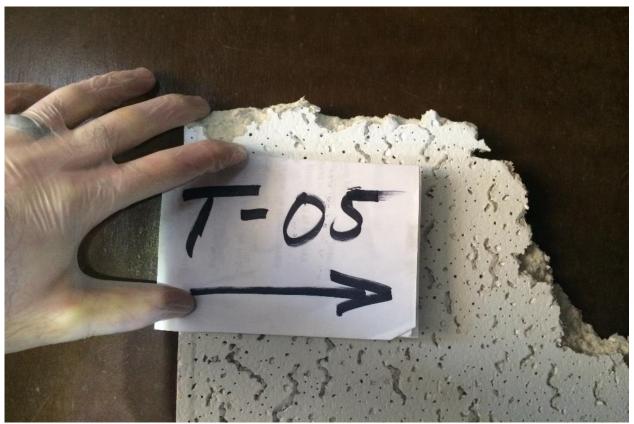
Laboratory analyses detected 2% chrysotile asbestos within suspended ceiling tile sample TS-06 collected from the Theatre Building hallway (sample should be labeled TS-06).
